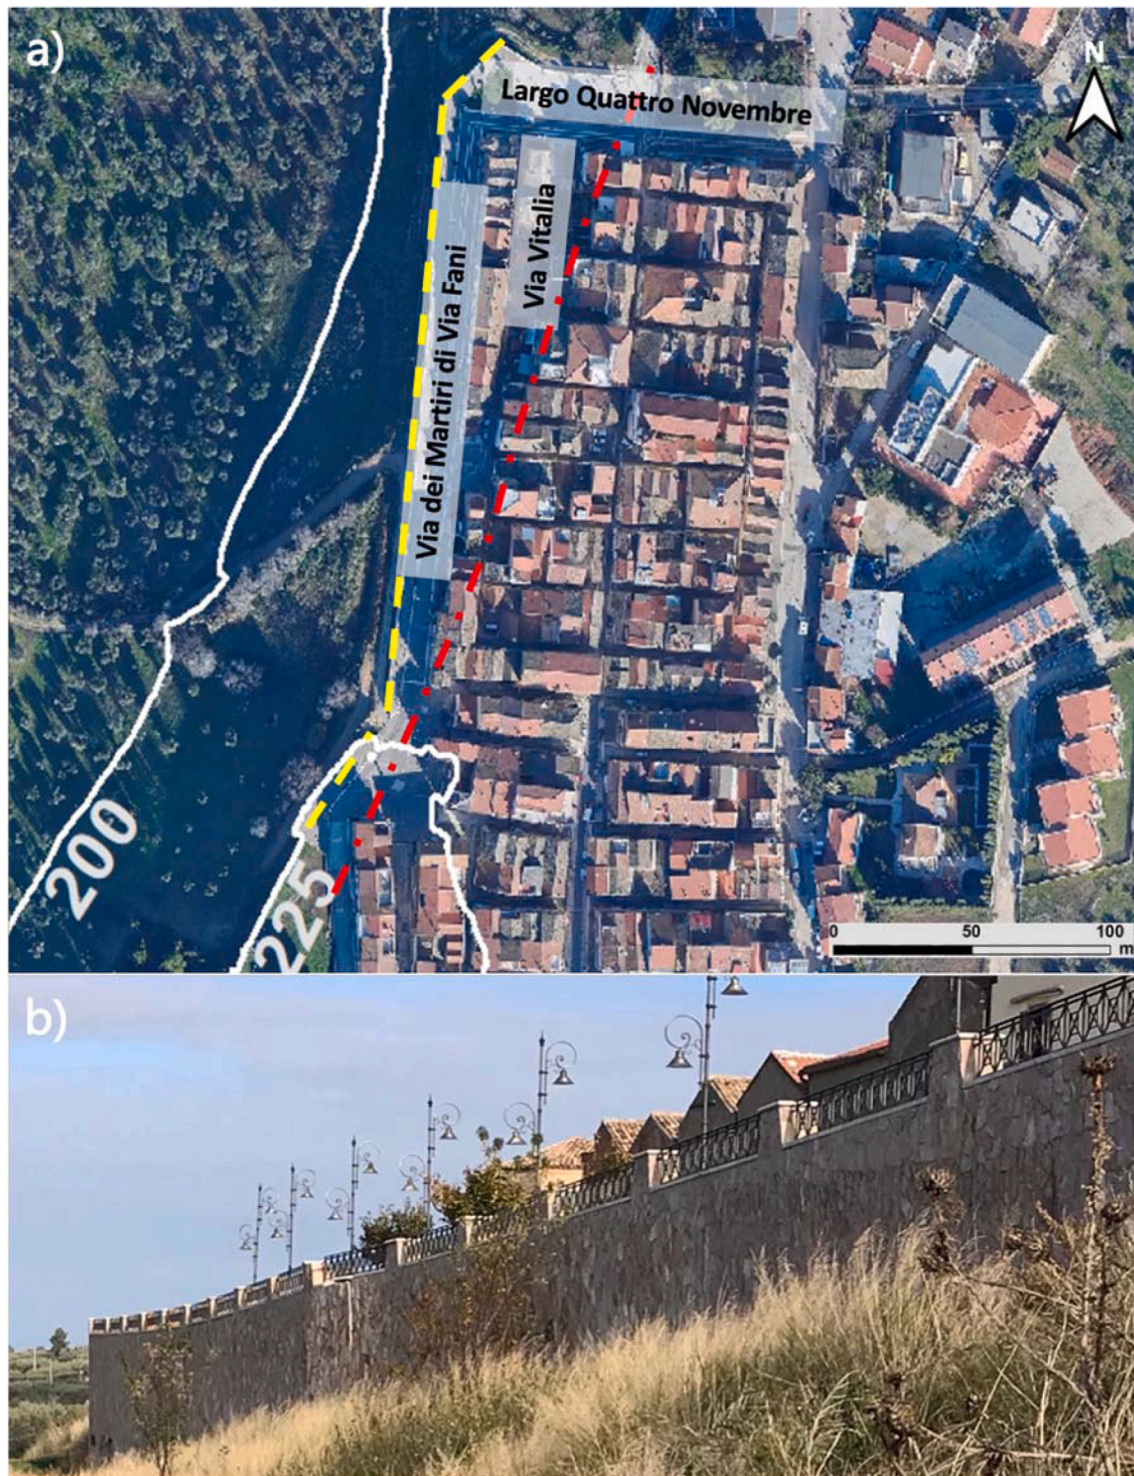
a) Sector of the old town involved in the instability phenomenon and b) view of the retaining structure located along Via dei Martiri di Via Fani.
